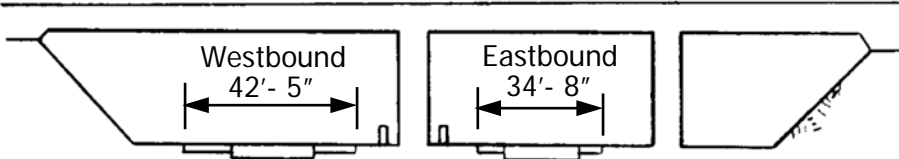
Bridge elevation view of horizontal clearances for highway feature carrying mainline and ramp traffic below the bridge.
